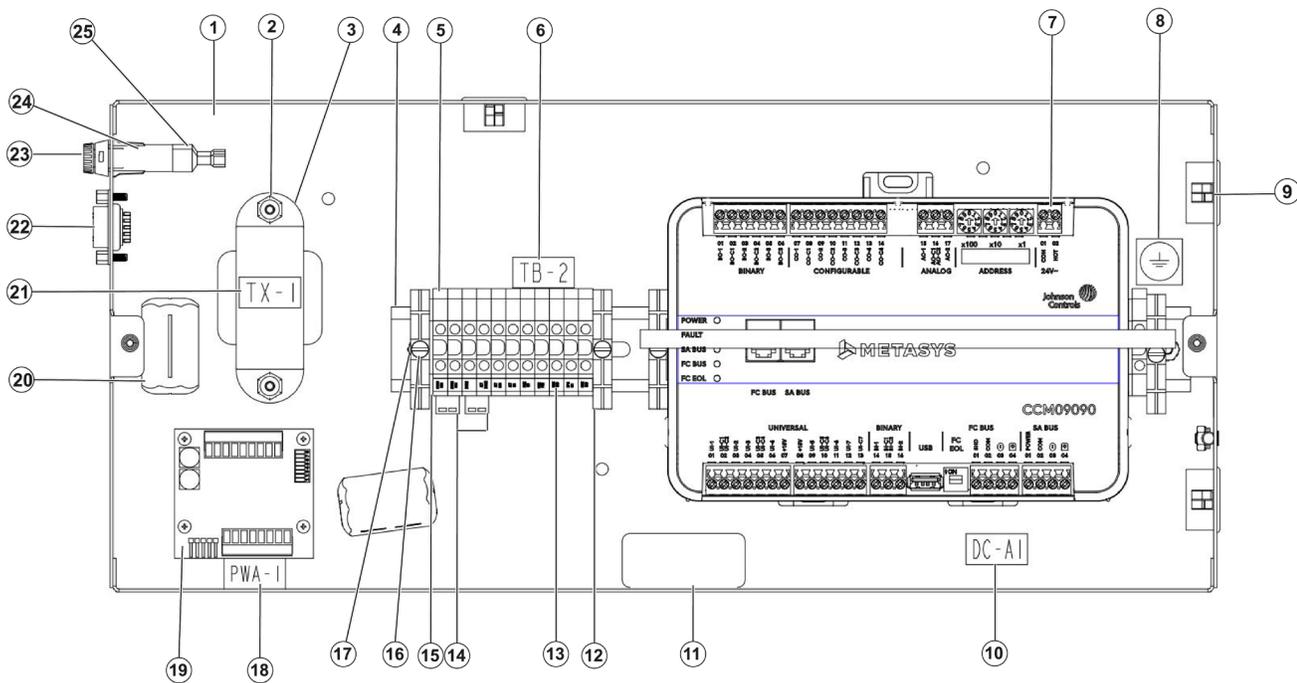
CCM09090 VALVE MOUNTED ROOM LEVEL CONTROLLER
